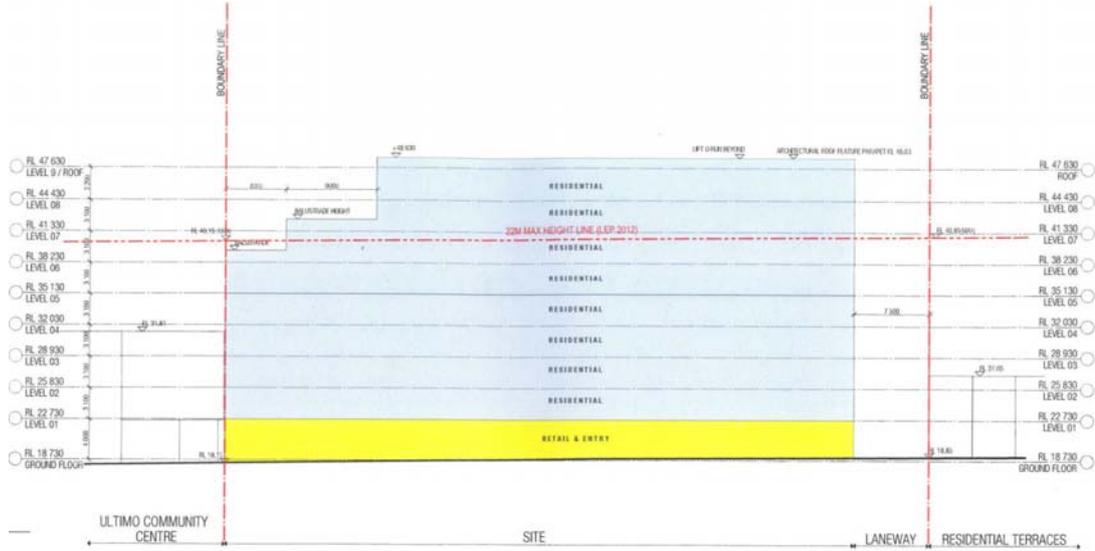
Eastern (Harris Street) Elevation of Stage 1 concept approval
